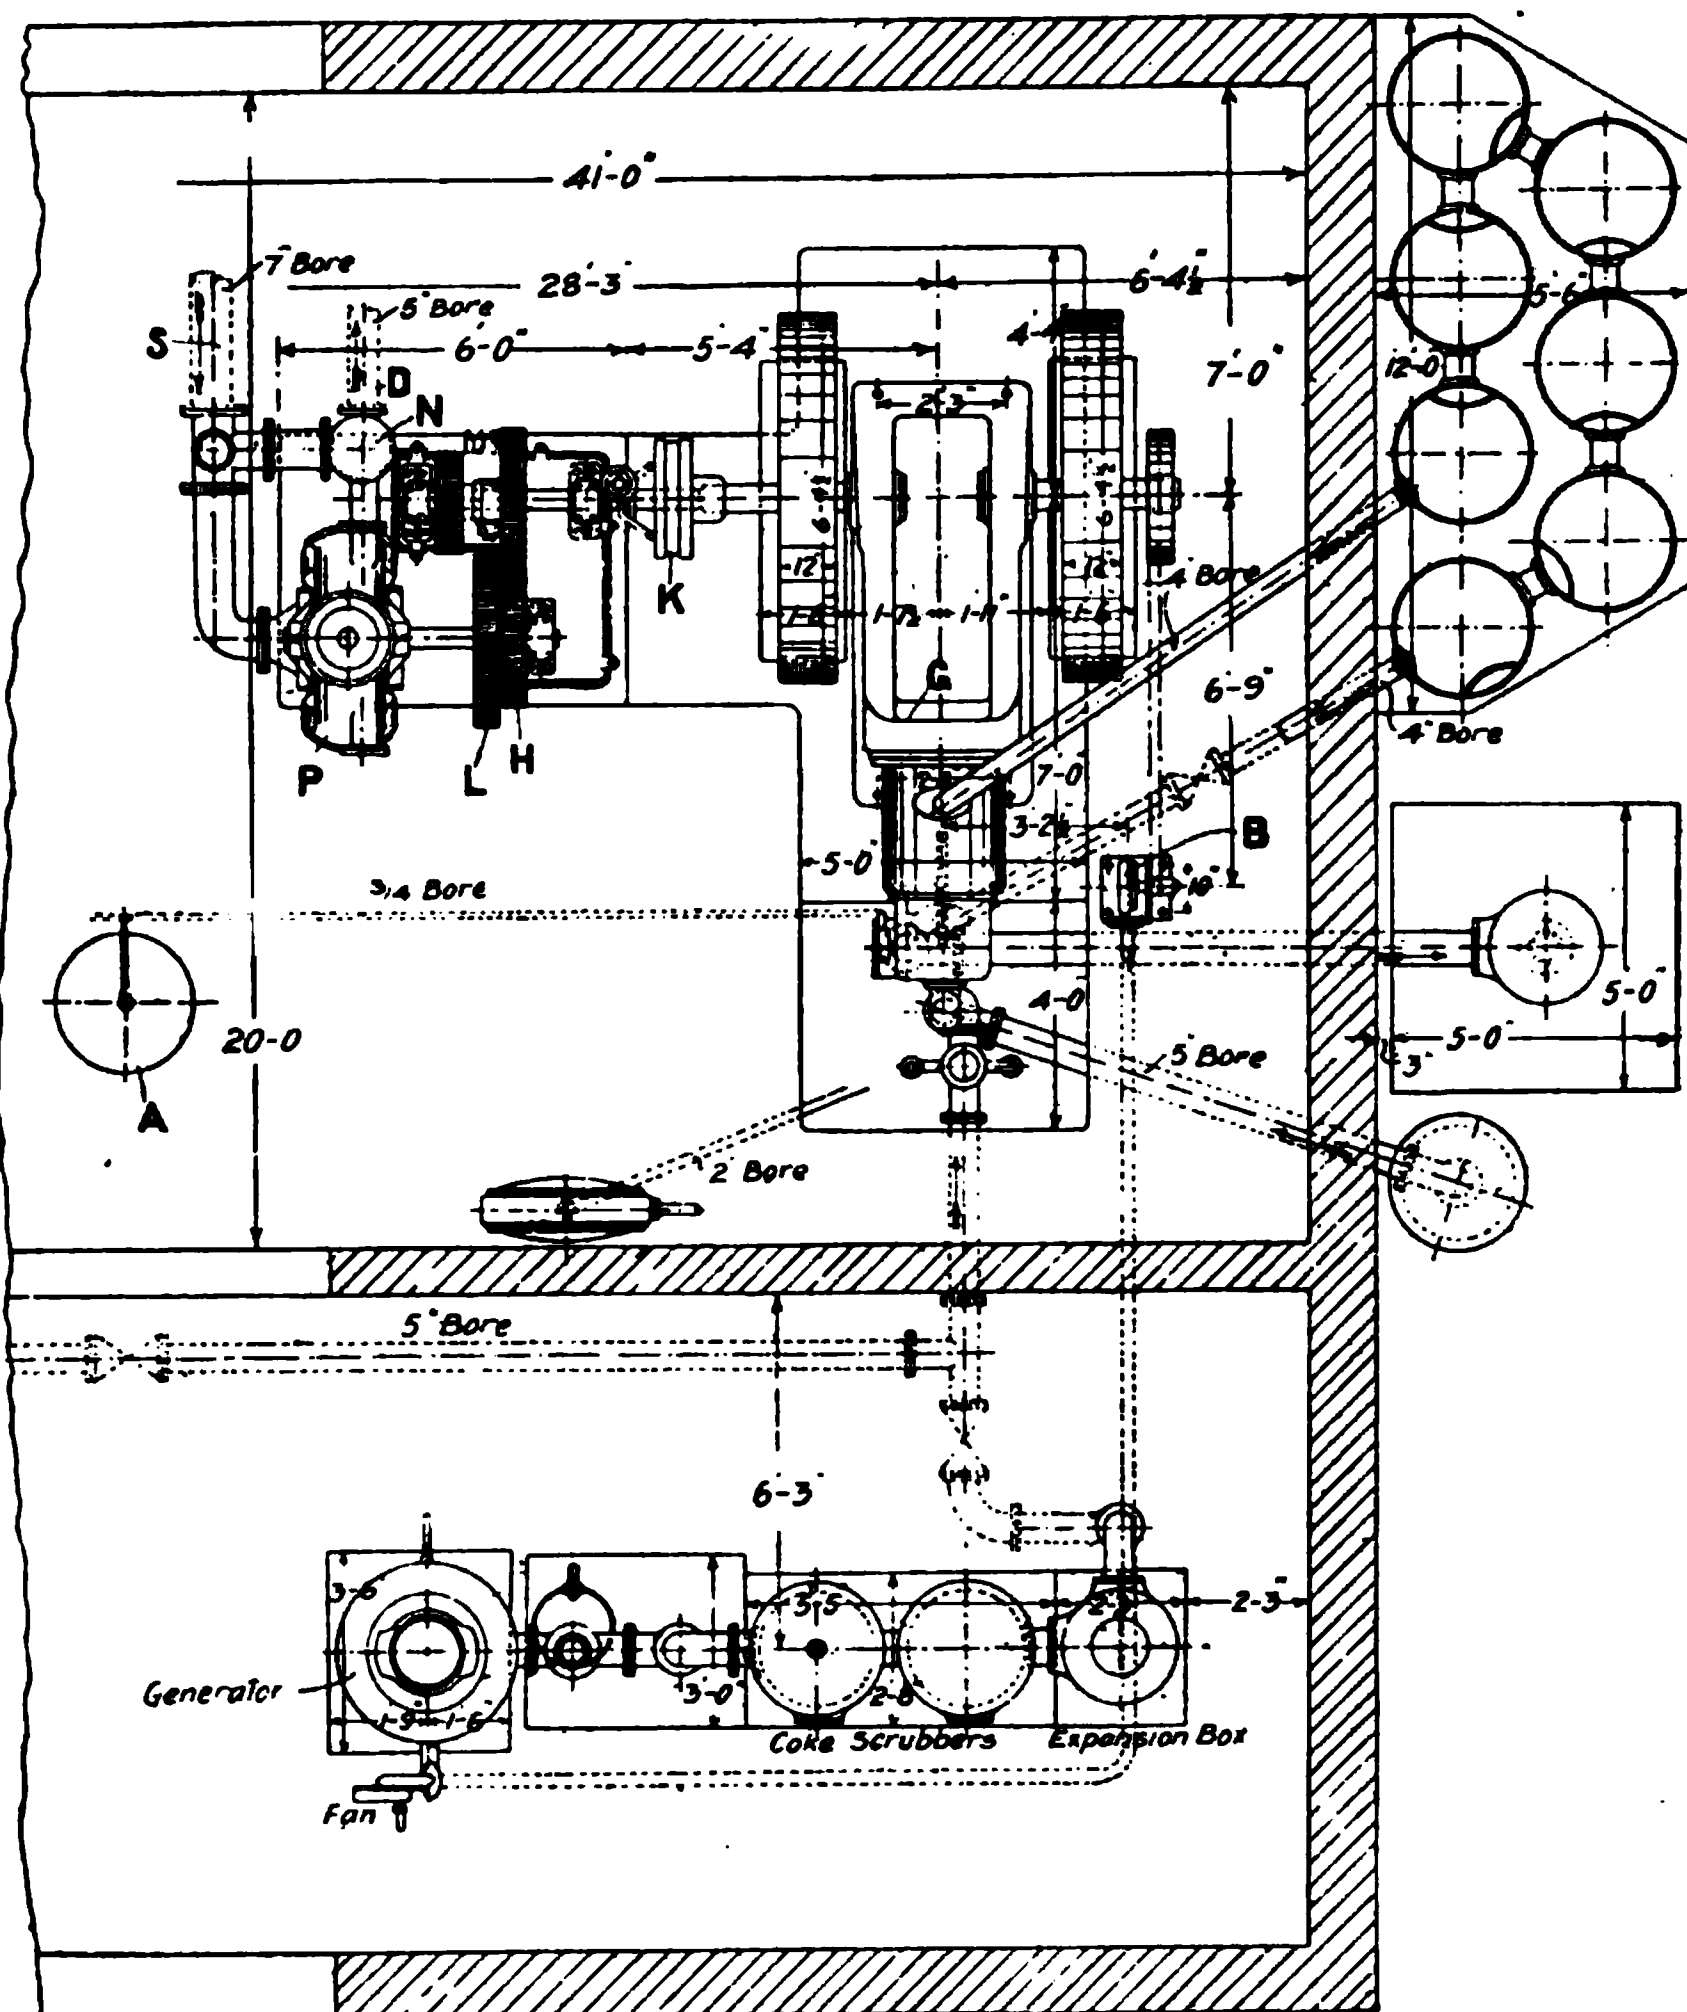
Half-plan Arrangement of Gas-power Pumping Plant.
